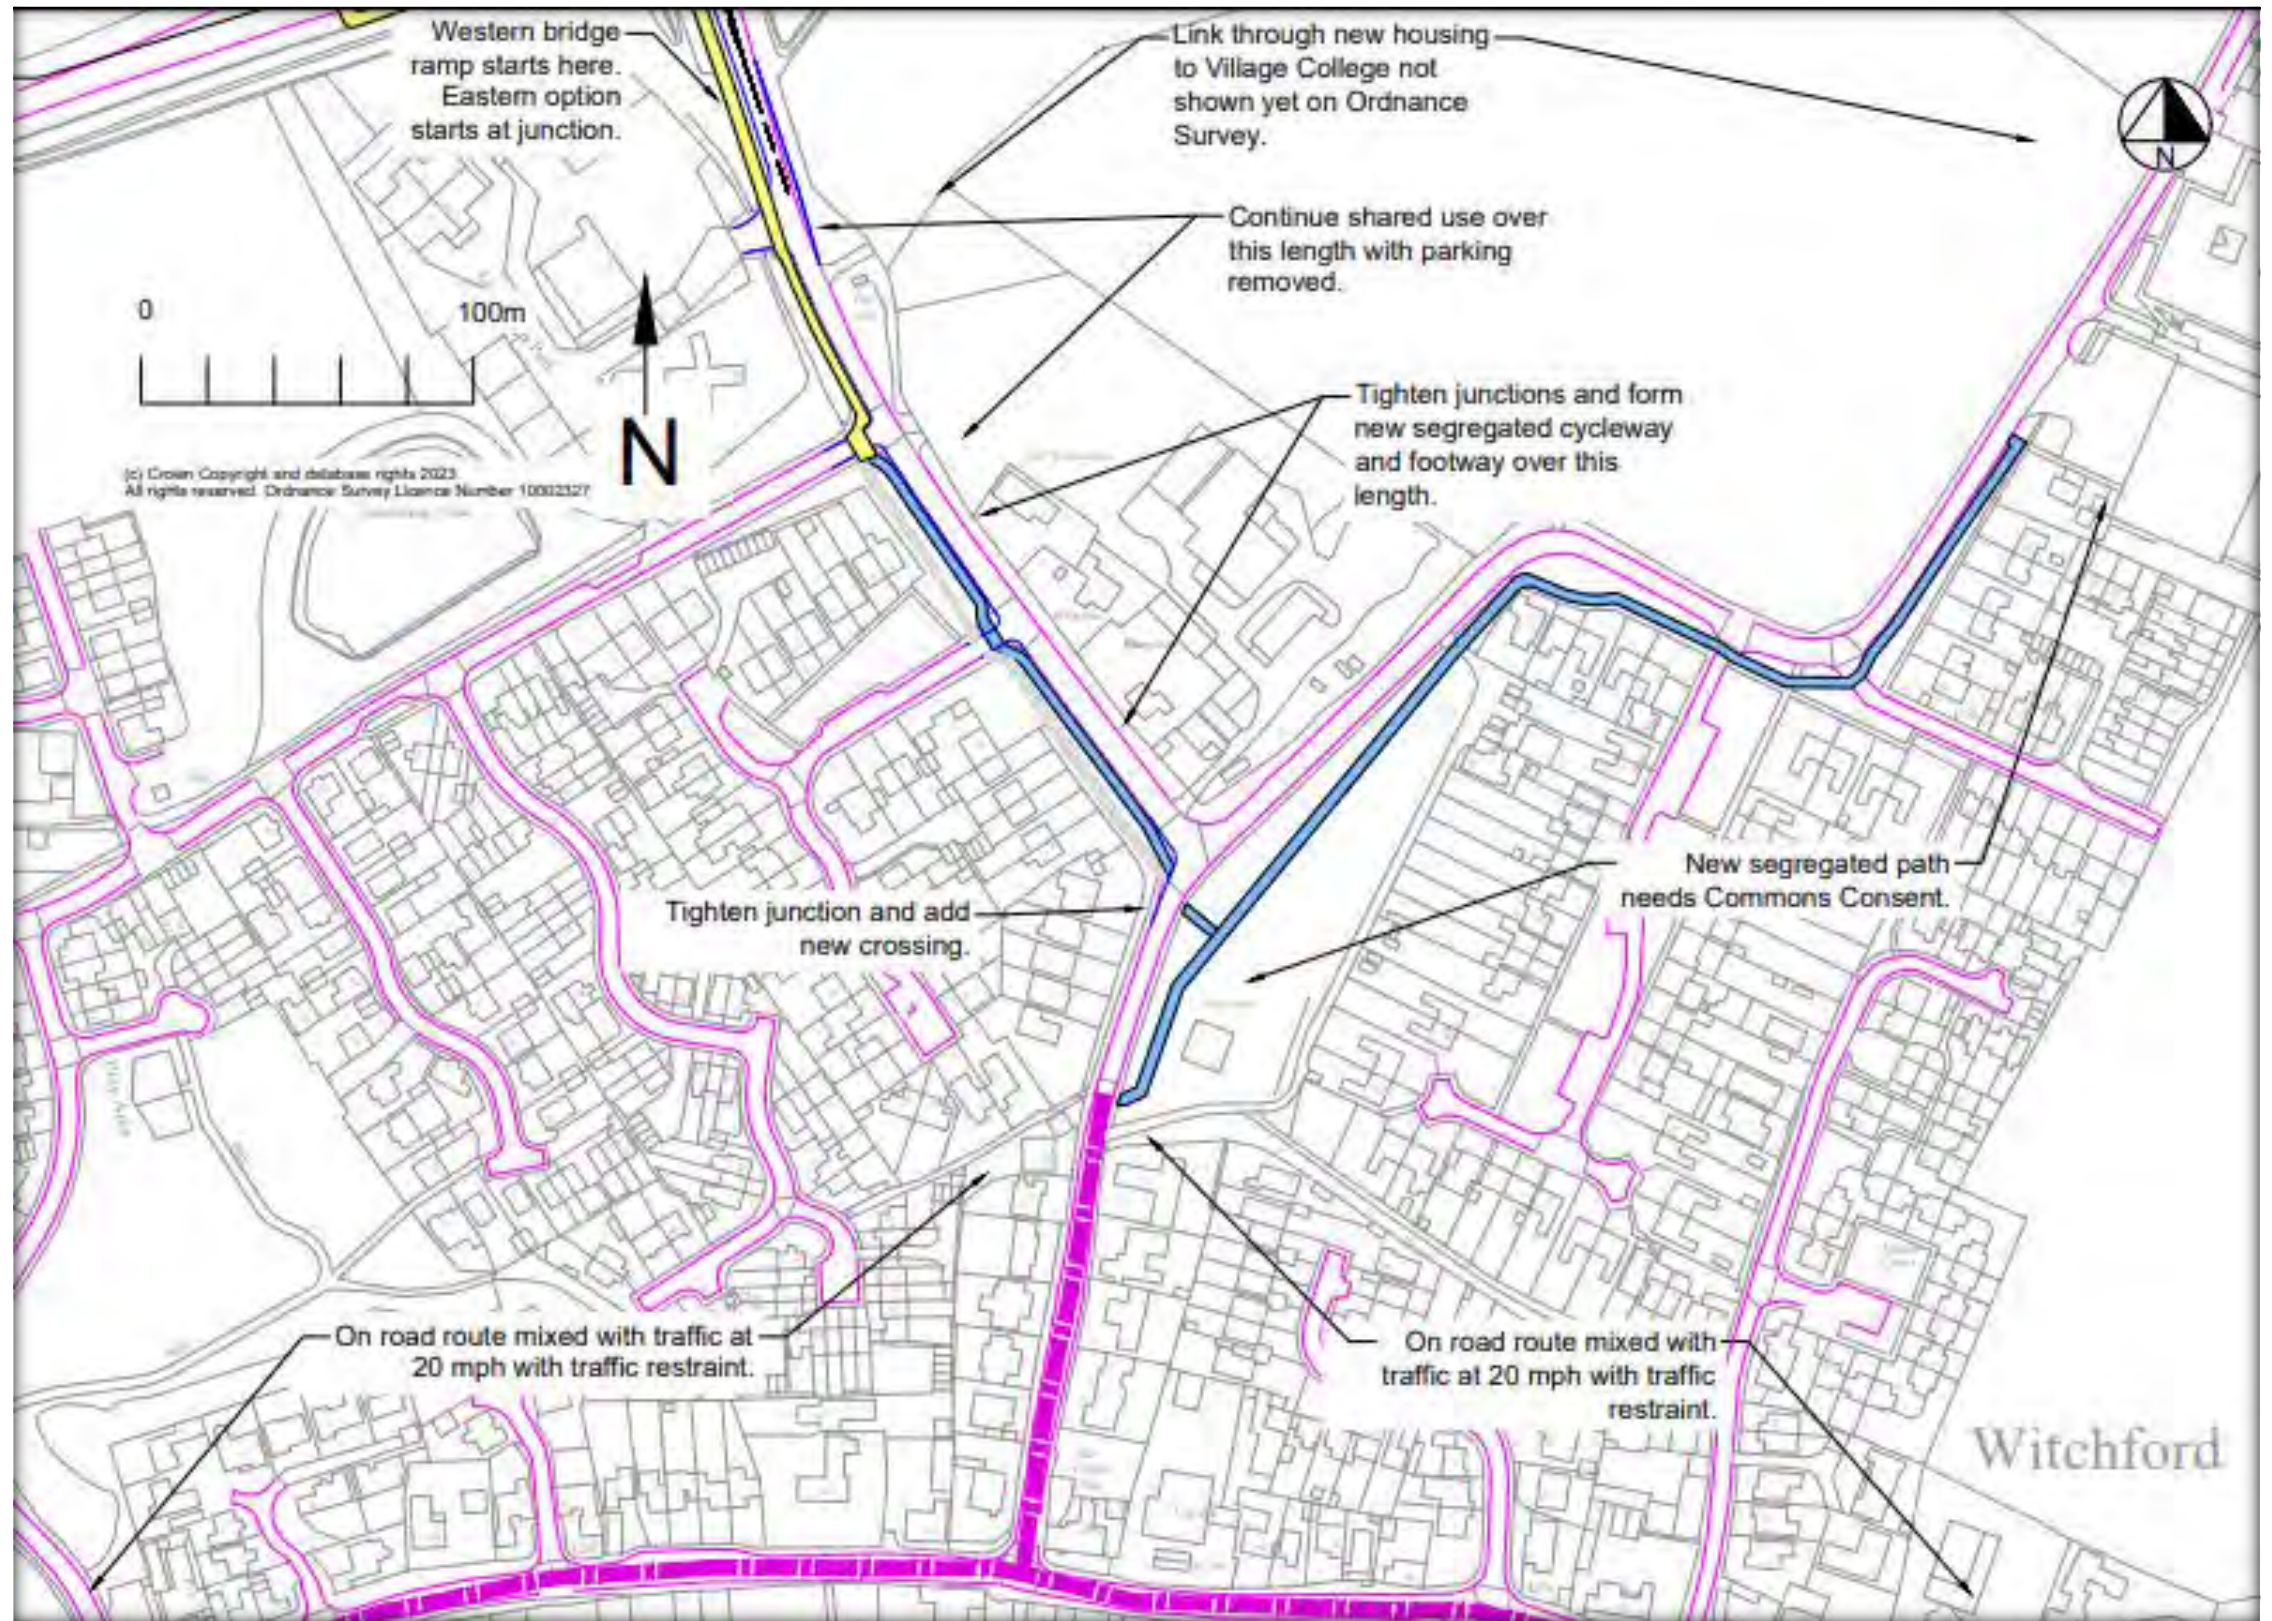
A.22.2 Preliminary Drawing showing proposed link along Common Road.
